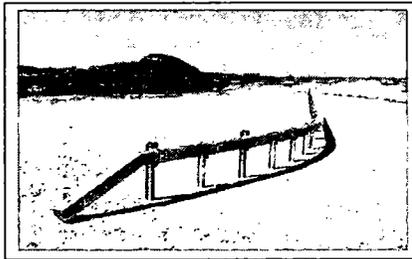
Box Beam Guiderail Type IIA End Terminal
